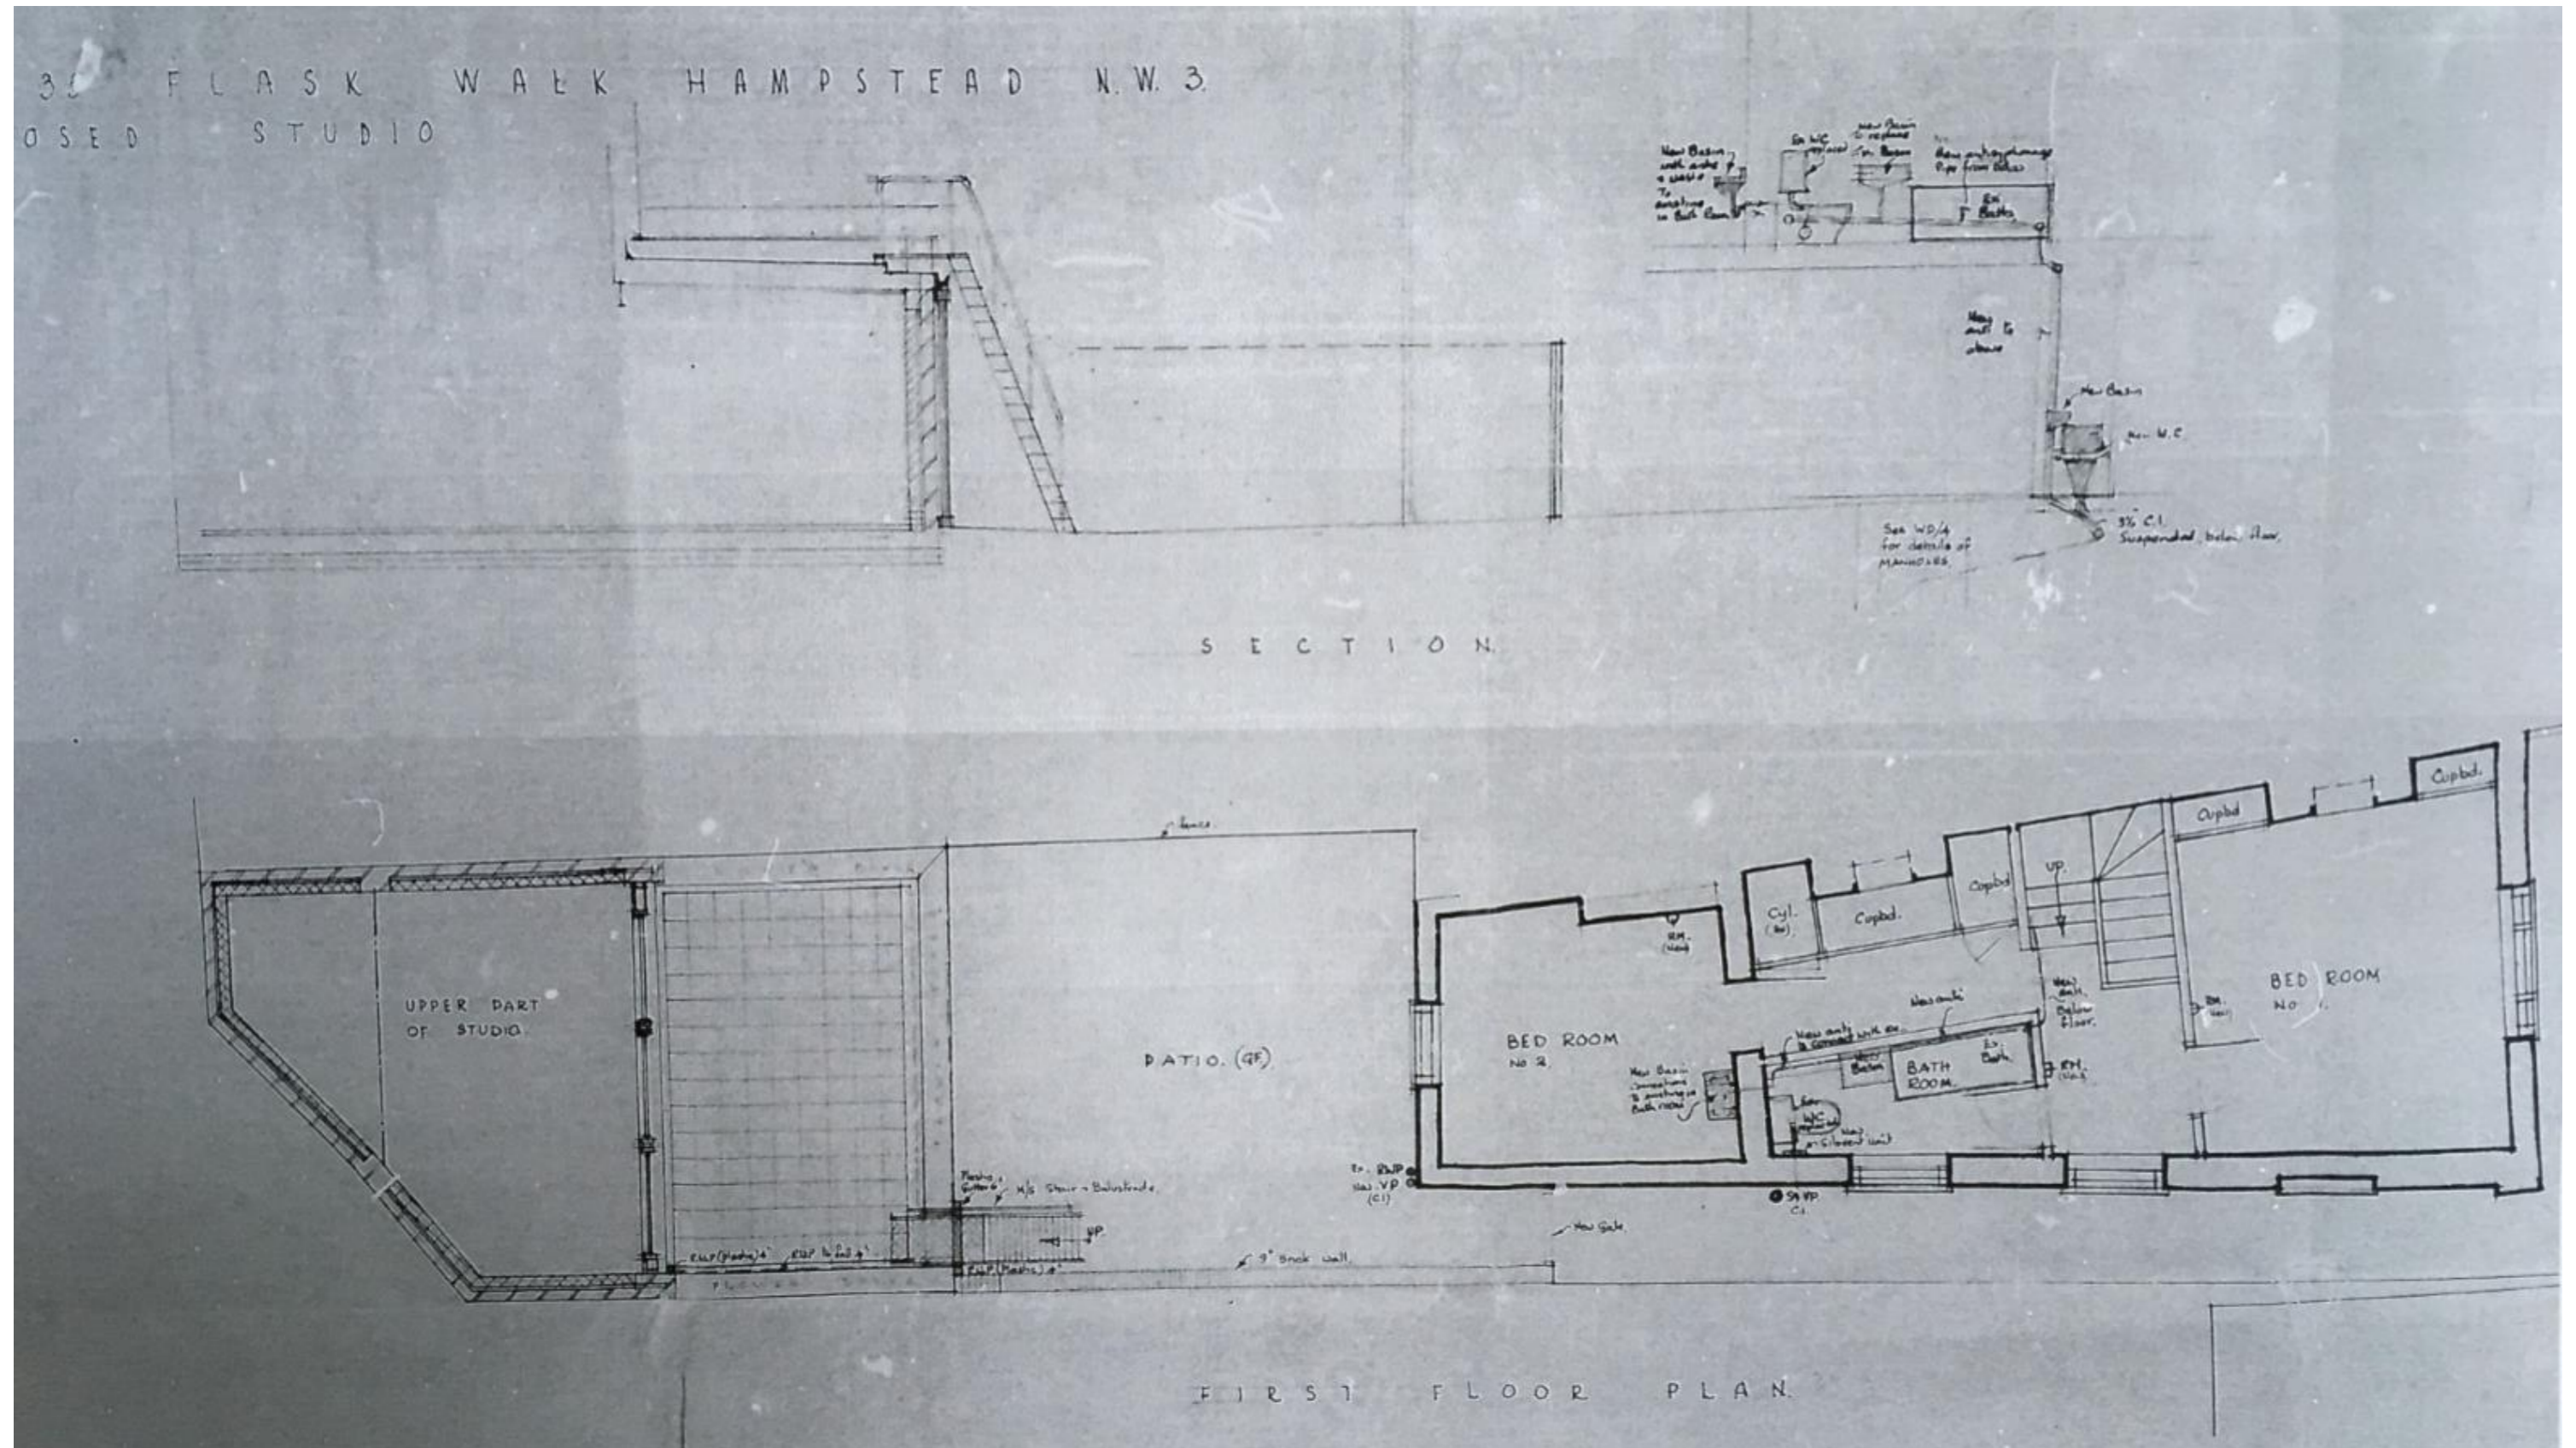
1969 Plans showing first floor plans and roof of Artist's Studio
